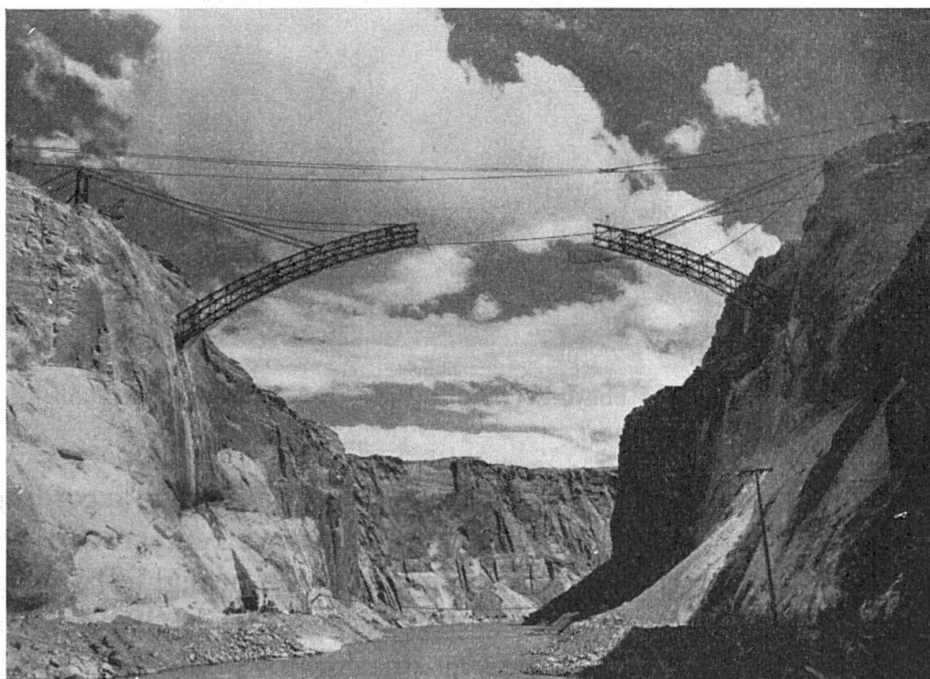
Bureau of Reclamation photograph No. P-557-420-2438.
